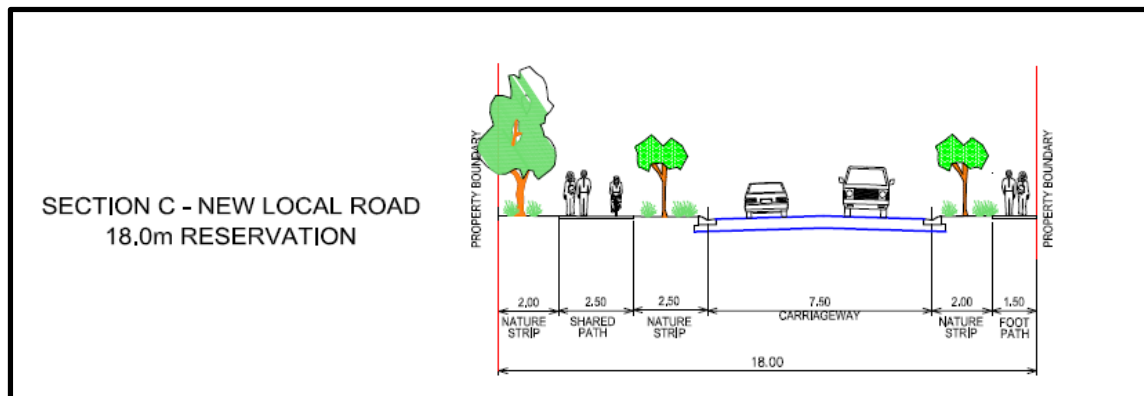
Cross-section for 18m wide public access road (Source: Traffic Group)
